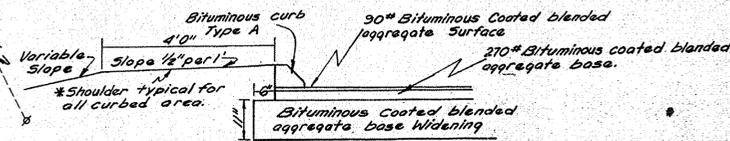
DETAIL OF INTERSECTION S.R.54 AND S.R.59
